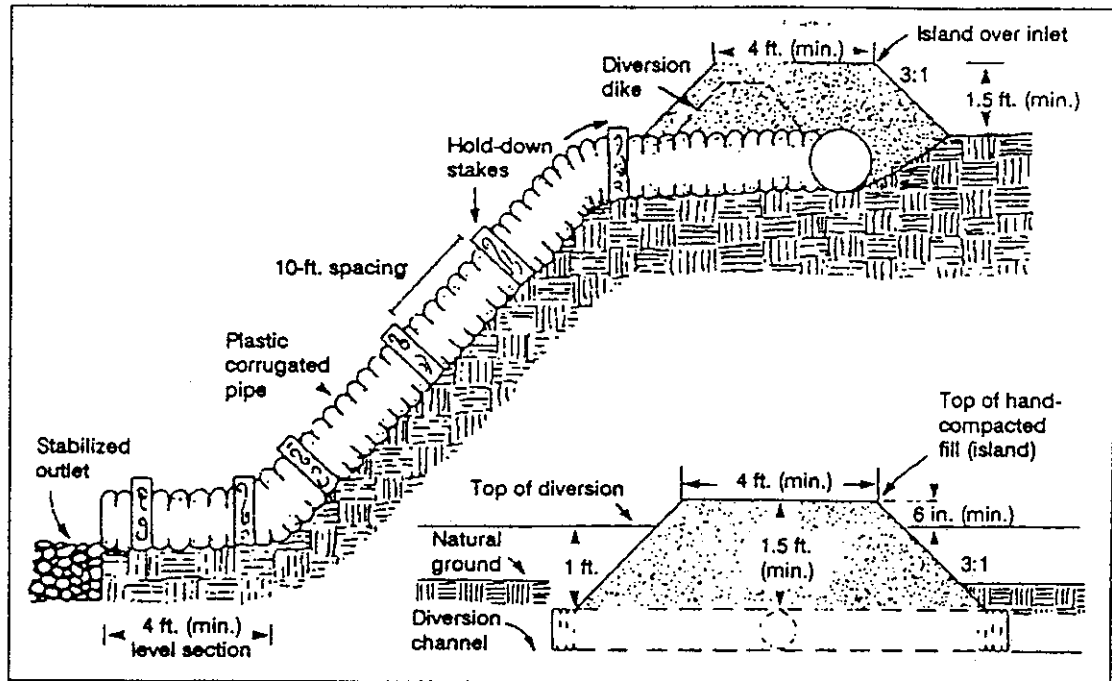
D. Cross-section view of a temporary slope drain, with detail of inlet.
